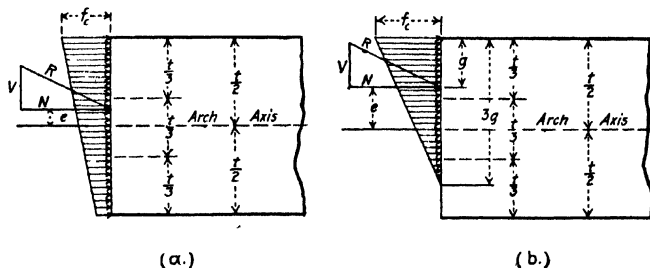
Stresses caused by forces acting on plain concrete section.
